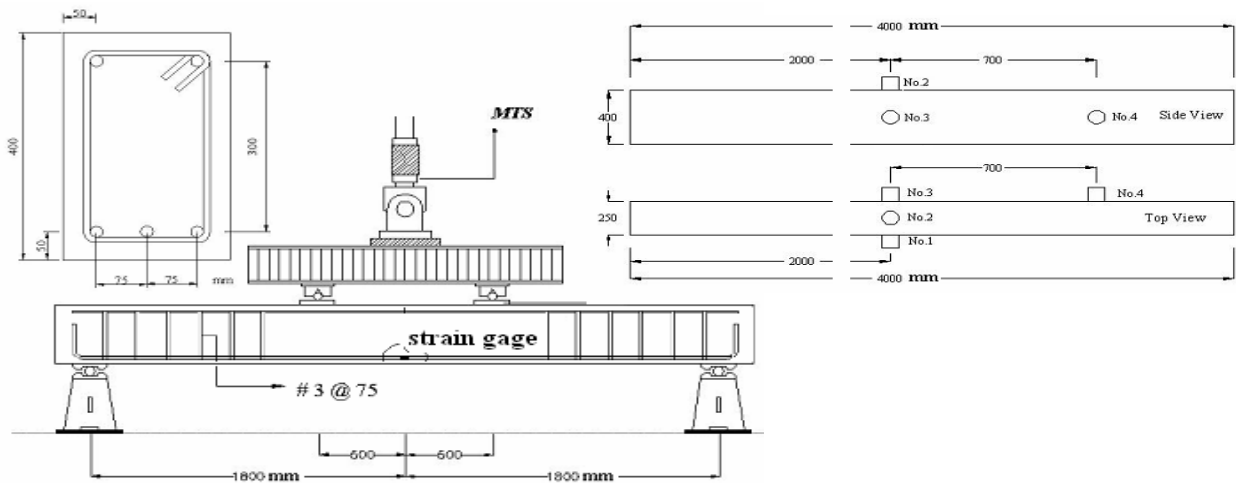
Beam specimen design, four-point bending test and the sensor locations
